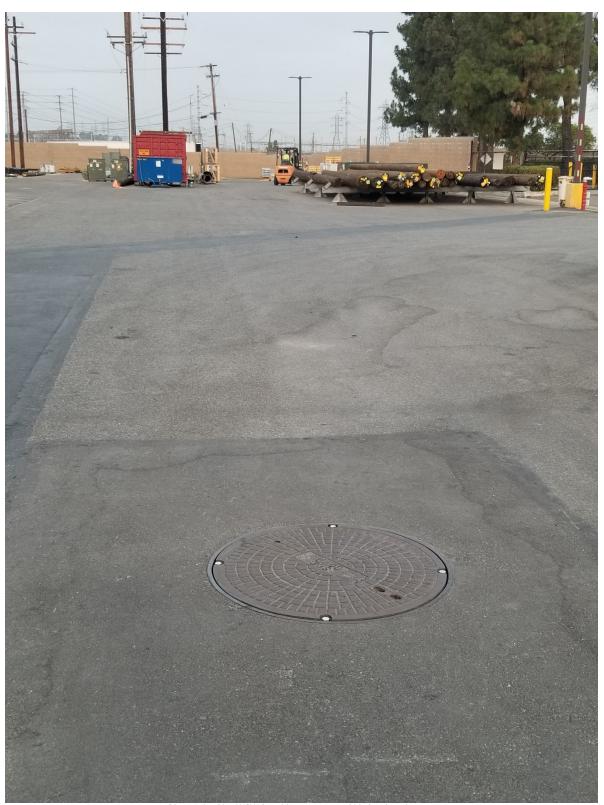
Looking WSW from M5654775 toward Marketplace Avenue.
